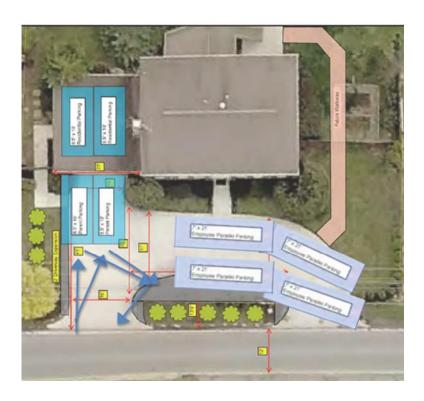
Applicant's Second Submittal for Vehicular Circulation and Parking (Proposed path highlighted in pink)
